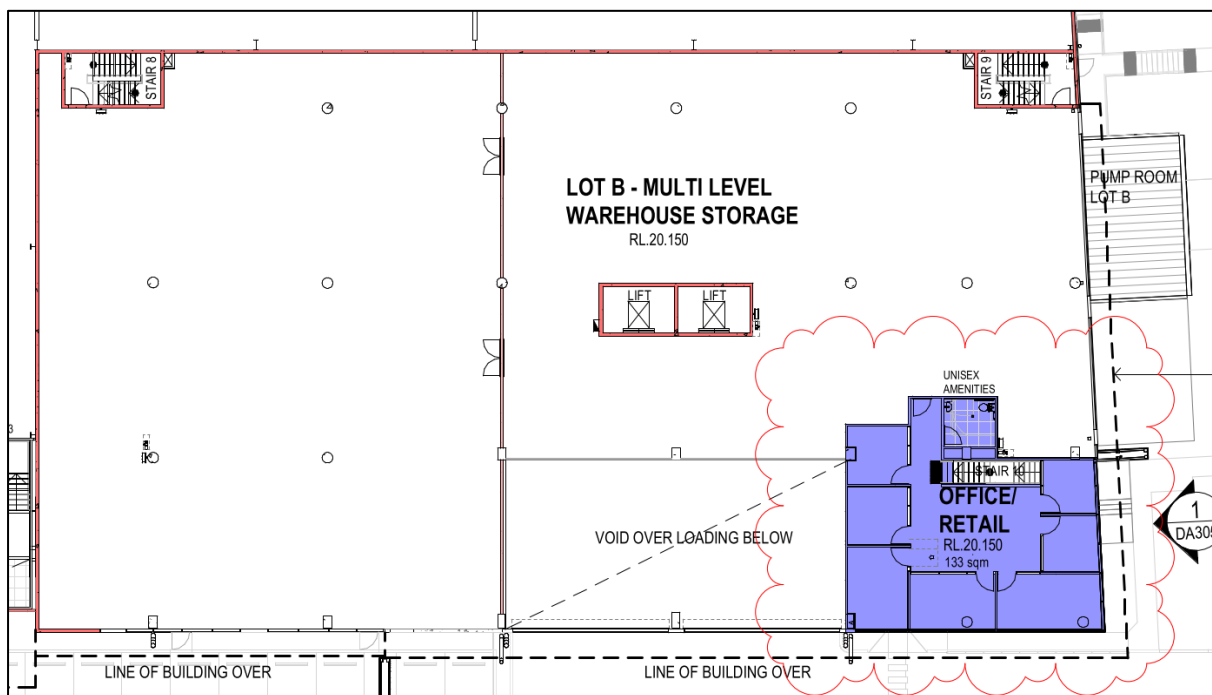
Extract of the proposed first floor alterations – Lot B Building 1.
